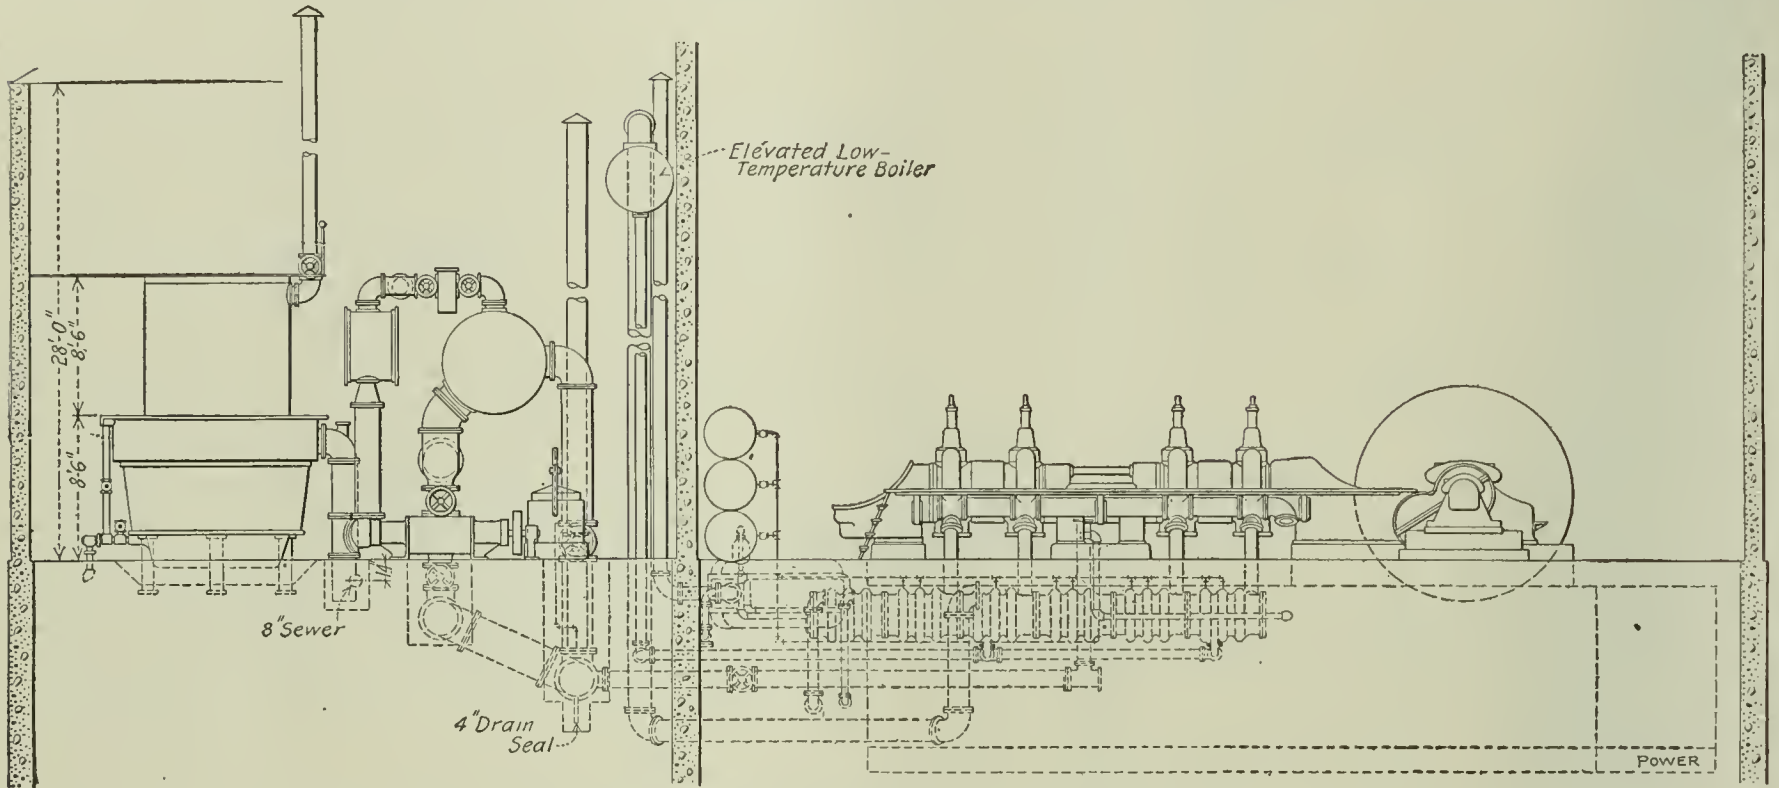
SECTIONAL ELEVATION THROUGH PLANT
